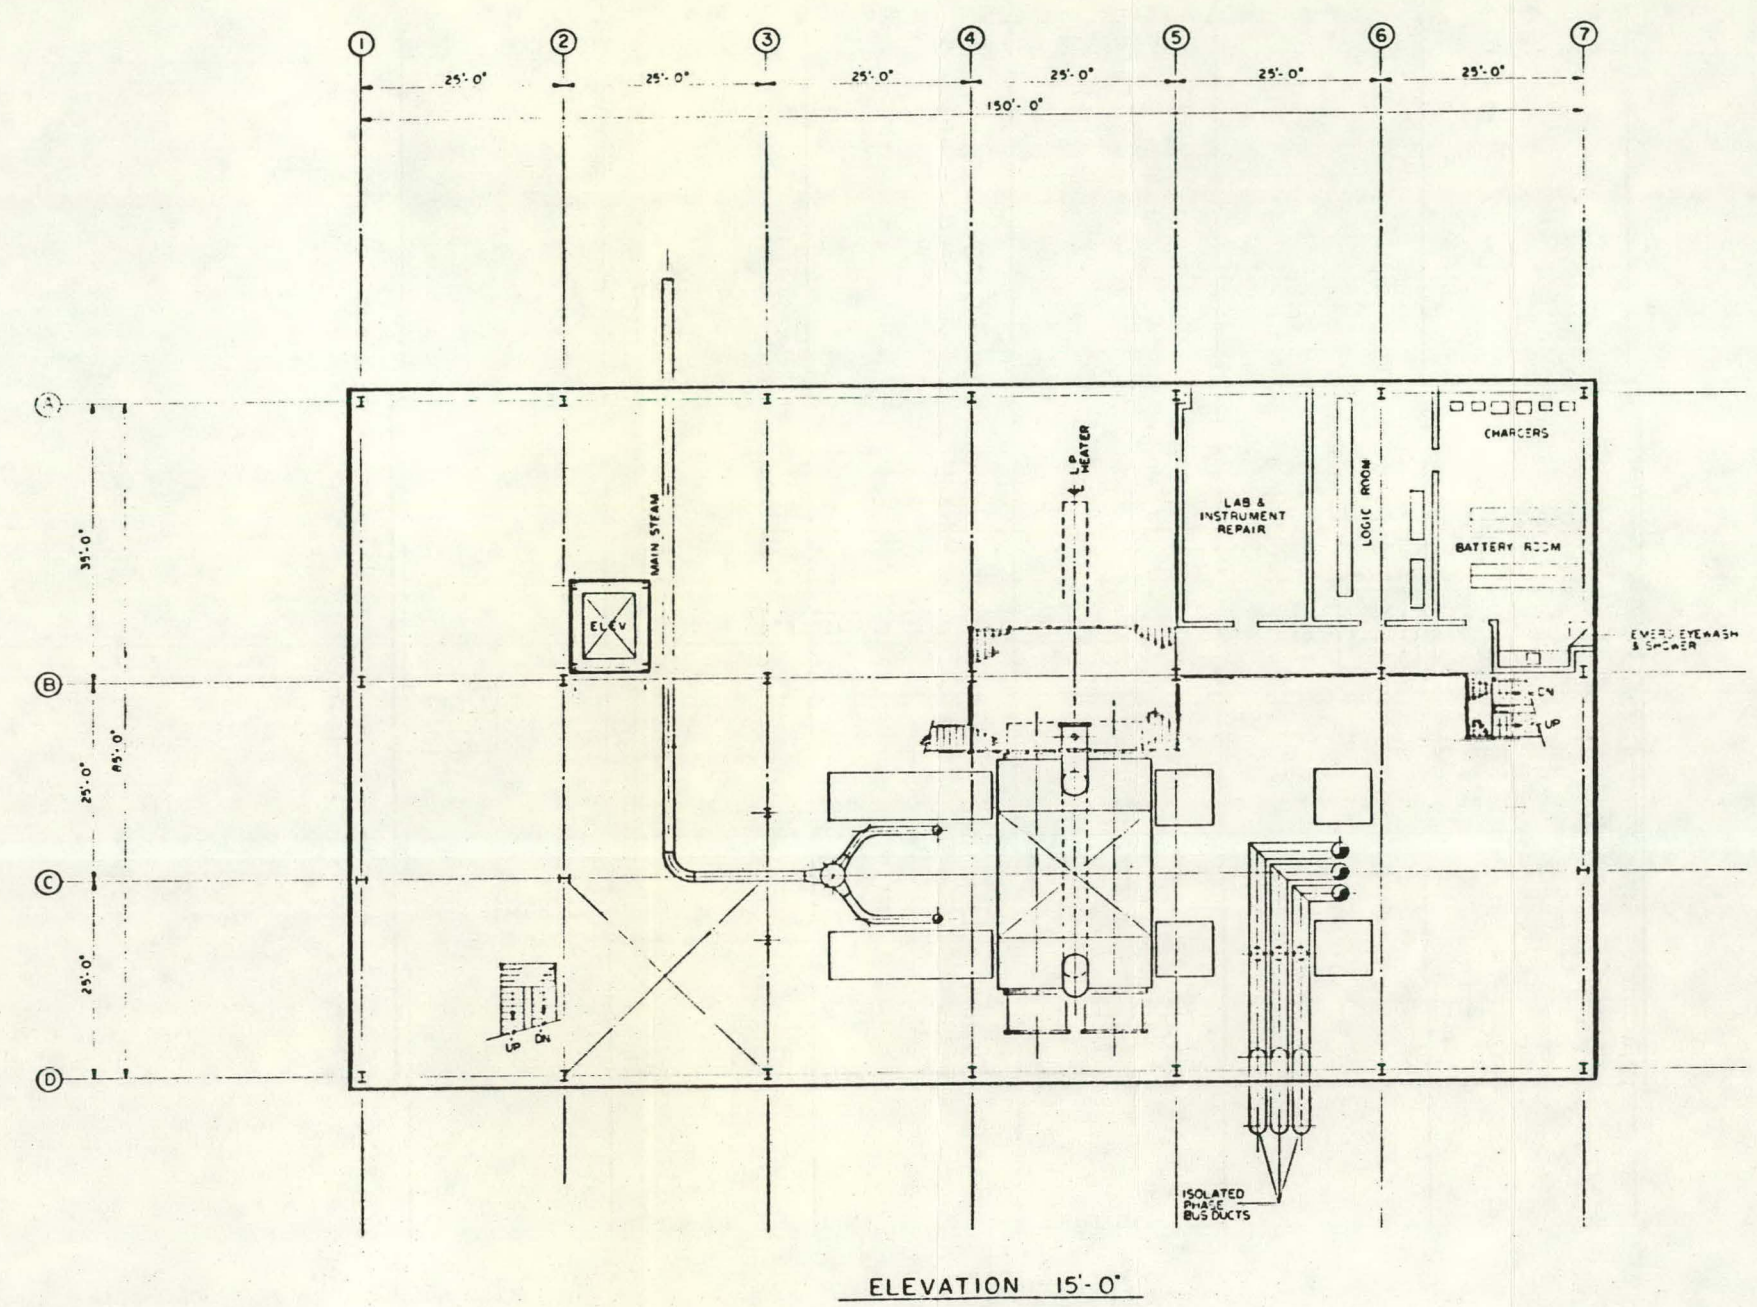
Commercial Plant General Arrangement -- Ground Floor, EPGS
